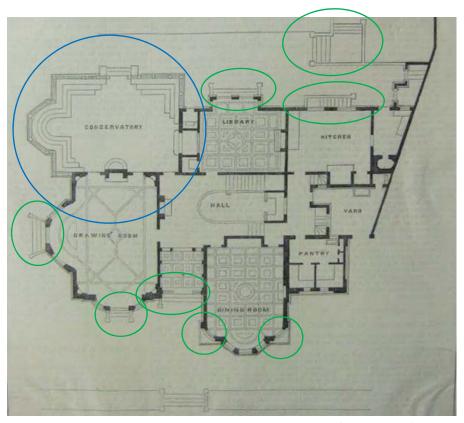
1868 Original Ground Floor Plan. The Conservatory (circled blue) was located within the space now occupied by number 20. This plan shows that from the beginning, cellars and built changes of external levels were characteristic of the building.
